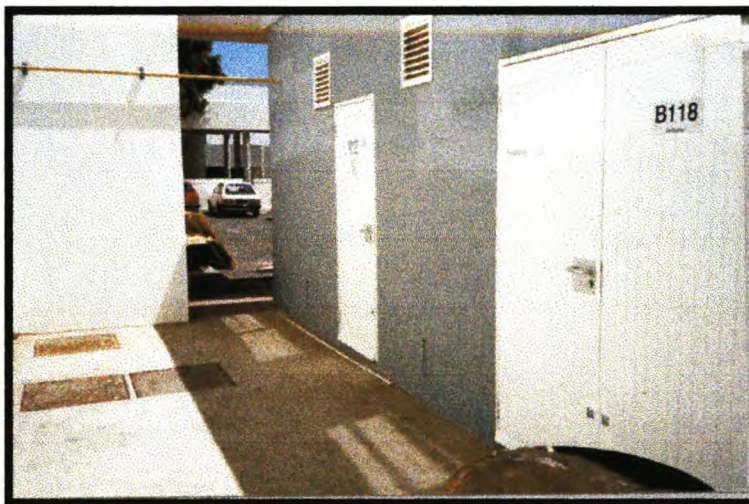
Enclosed waste storage area outside the JC Smuts Building
